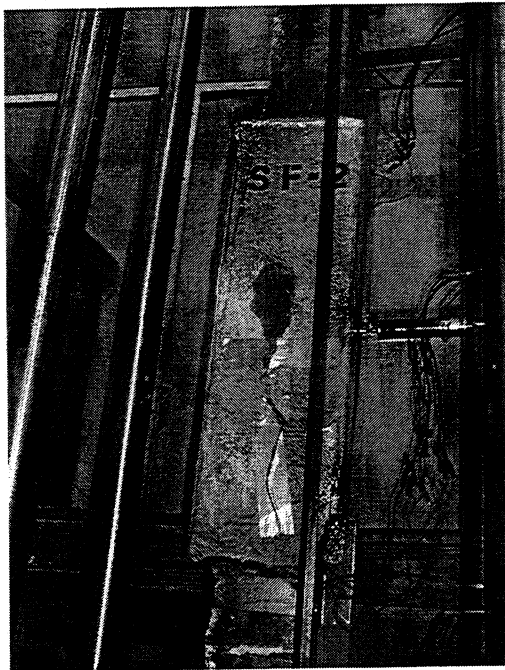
Failure of Non-Structural Formed Repairs Under Concentric Loads.
